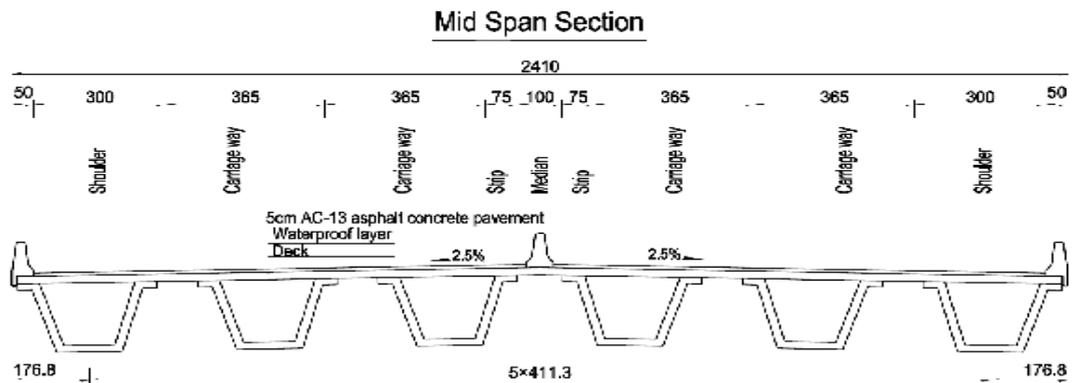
Standard Bridge Cross-Section (24.1m width)
